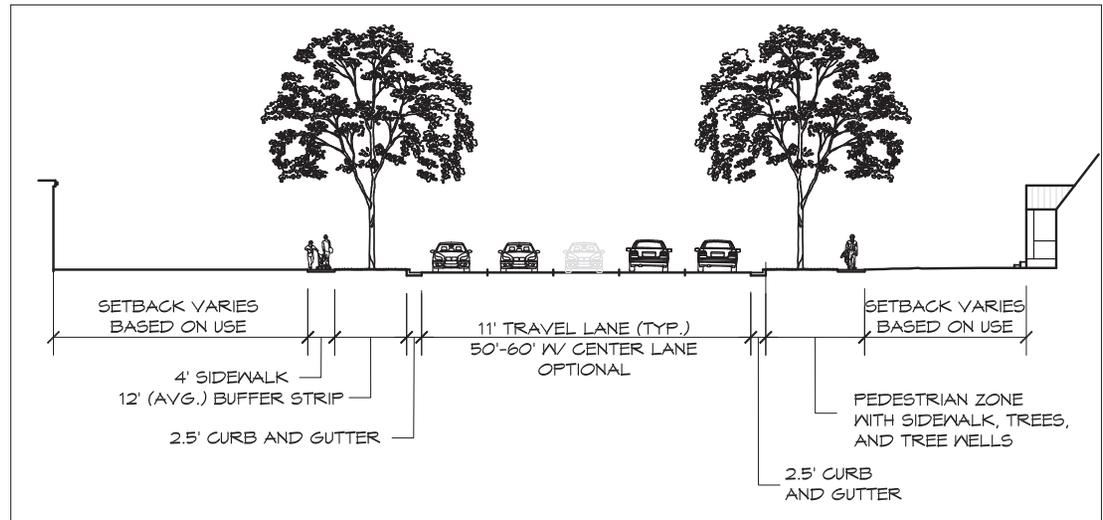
A CROSS-SECTION (TYPICAL) OF THE HIGHWAY/MAJOR ROAD STREETScape IN OLD WINDERMERE.
